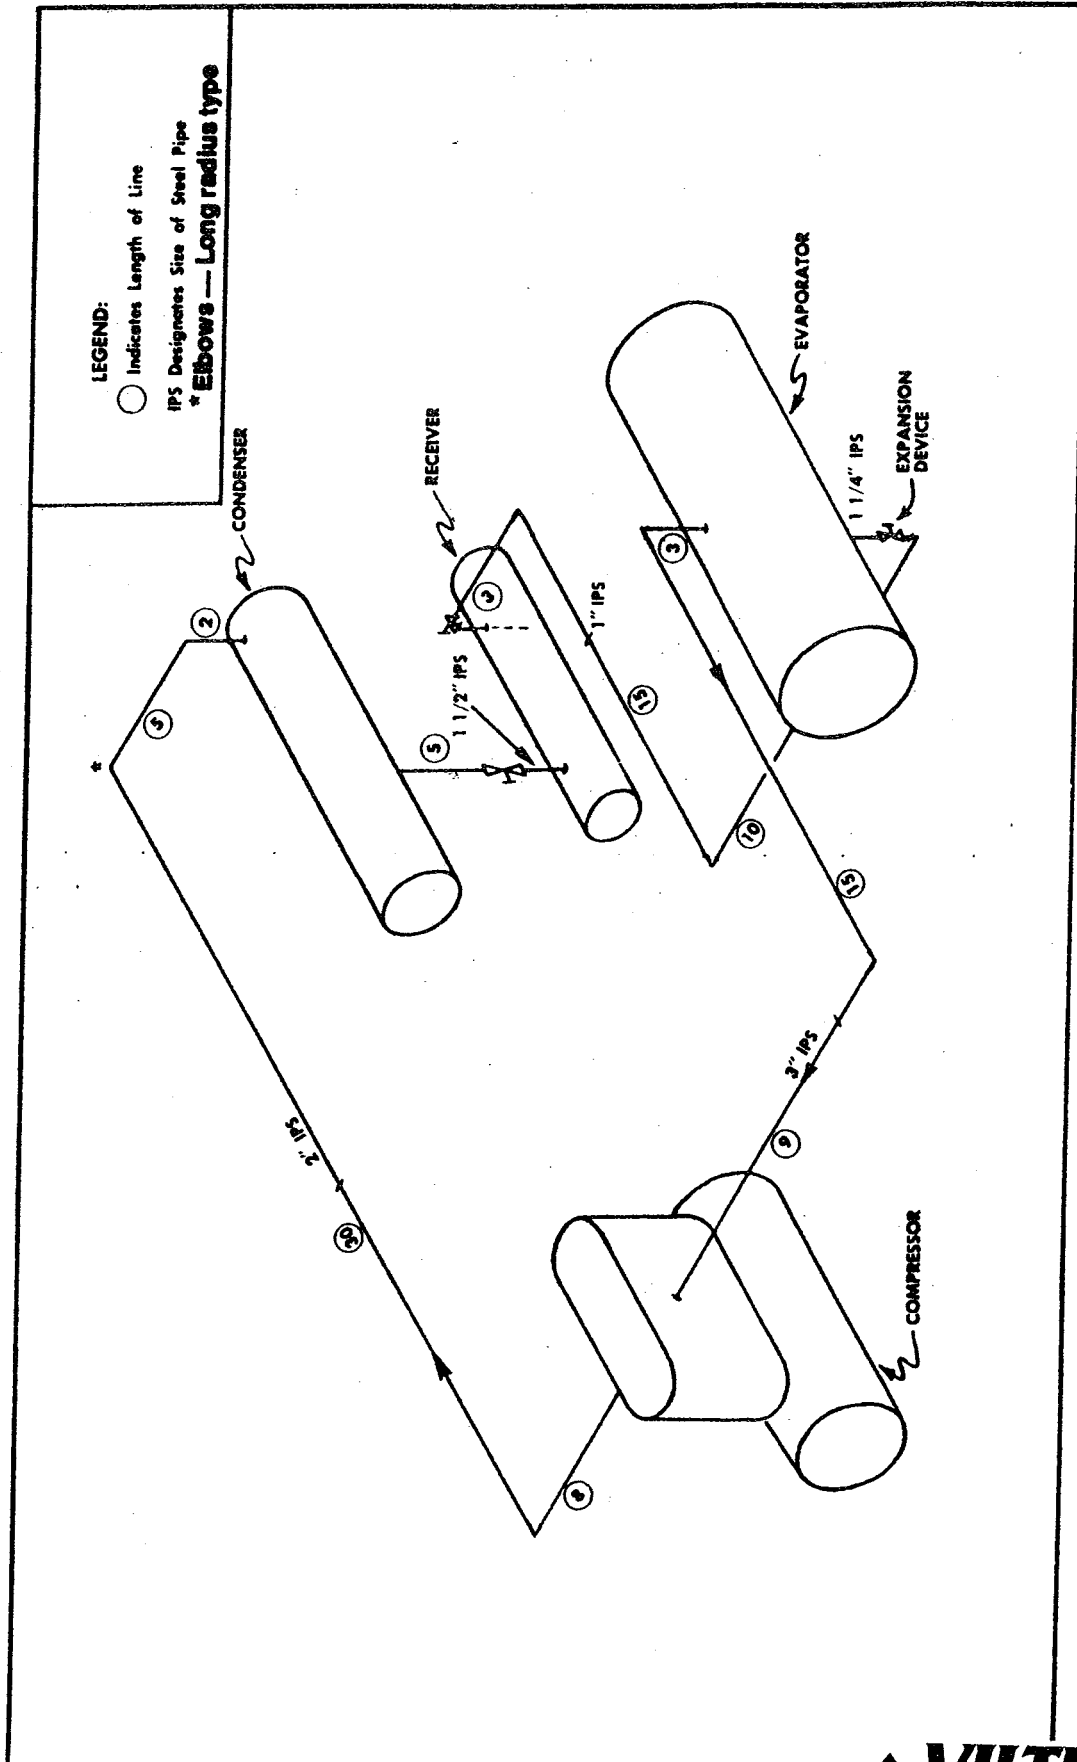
SCHEMATIC PIPING LAYOUT FOR SAMPLE PROBLEM
